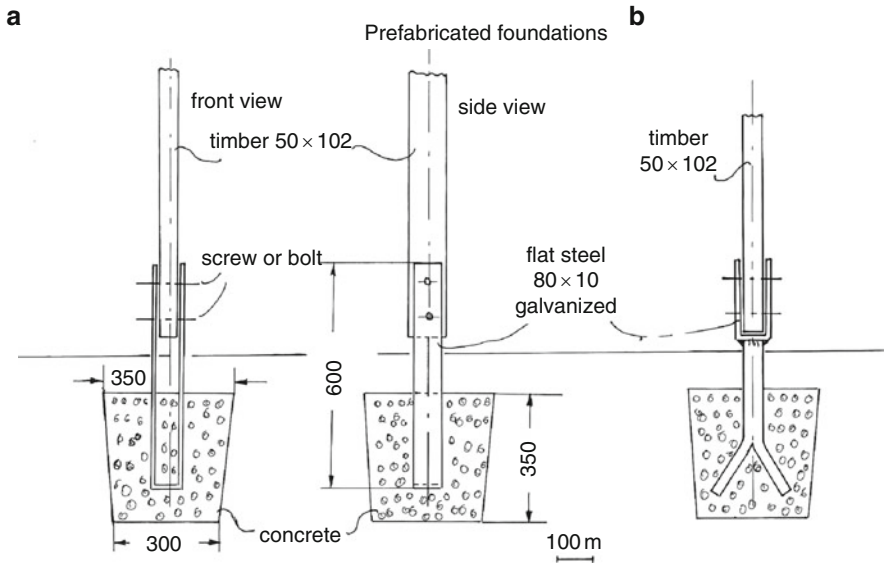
Prefabricated foundations can be used for timber structures, for example. The timber stanchion should not be inserted directly into the soil or into the concrete footing, but should be fastened in a steel or wooden holder, which is inserted in the concrete footing. In that way, rotting of the structure can be avoided
